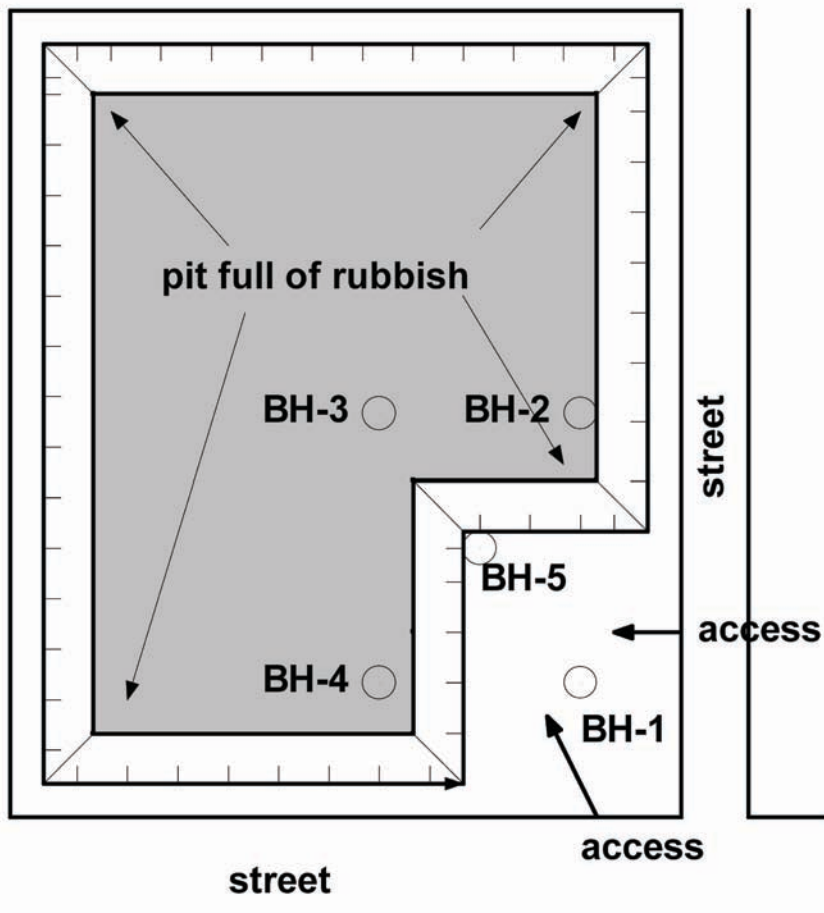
Sketch of the excavation: plan view of the hidden pit full of rubbish.
